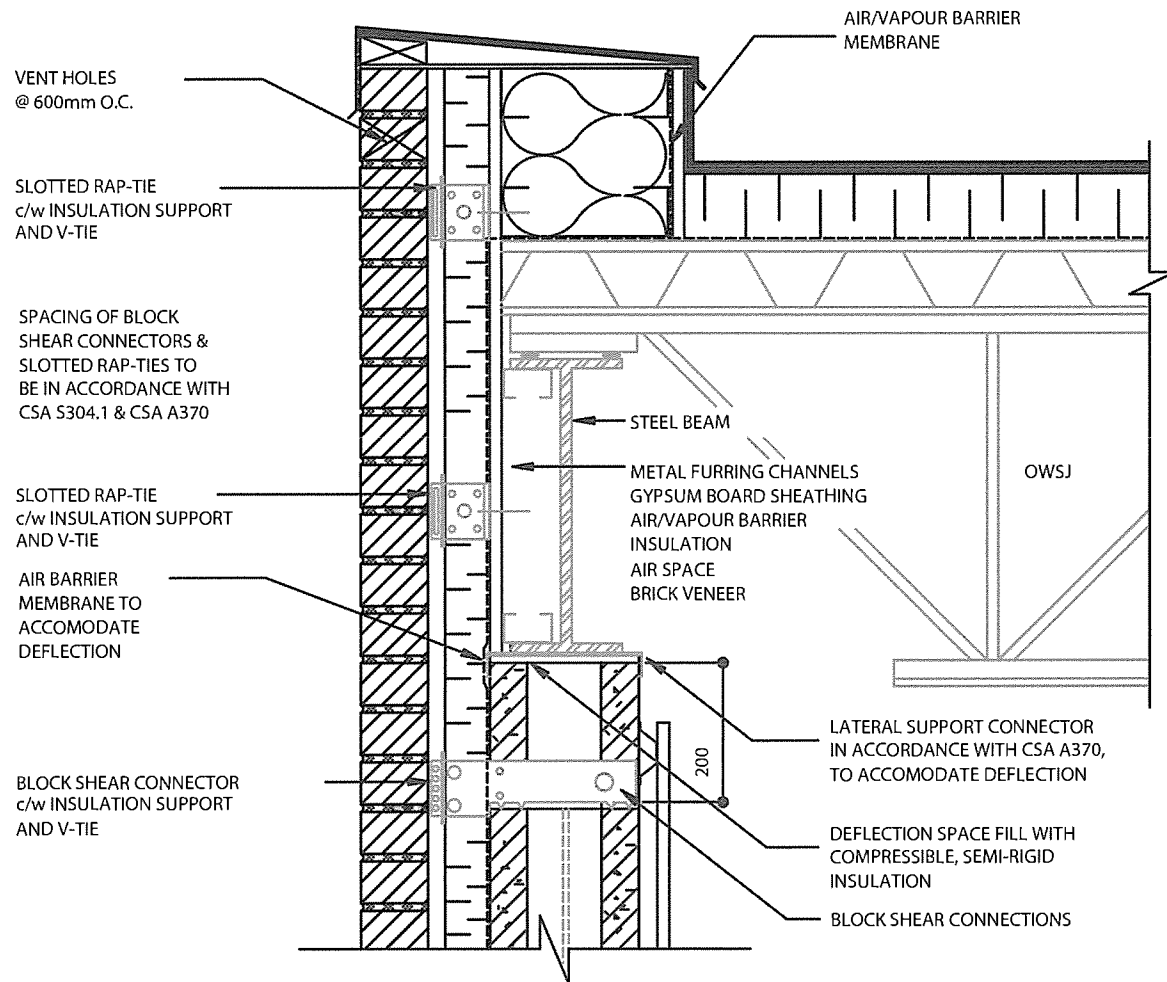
BRICK VENEER / CONCRETE BLOCK - PARAPET DETAIL @ O.W.S.J.
